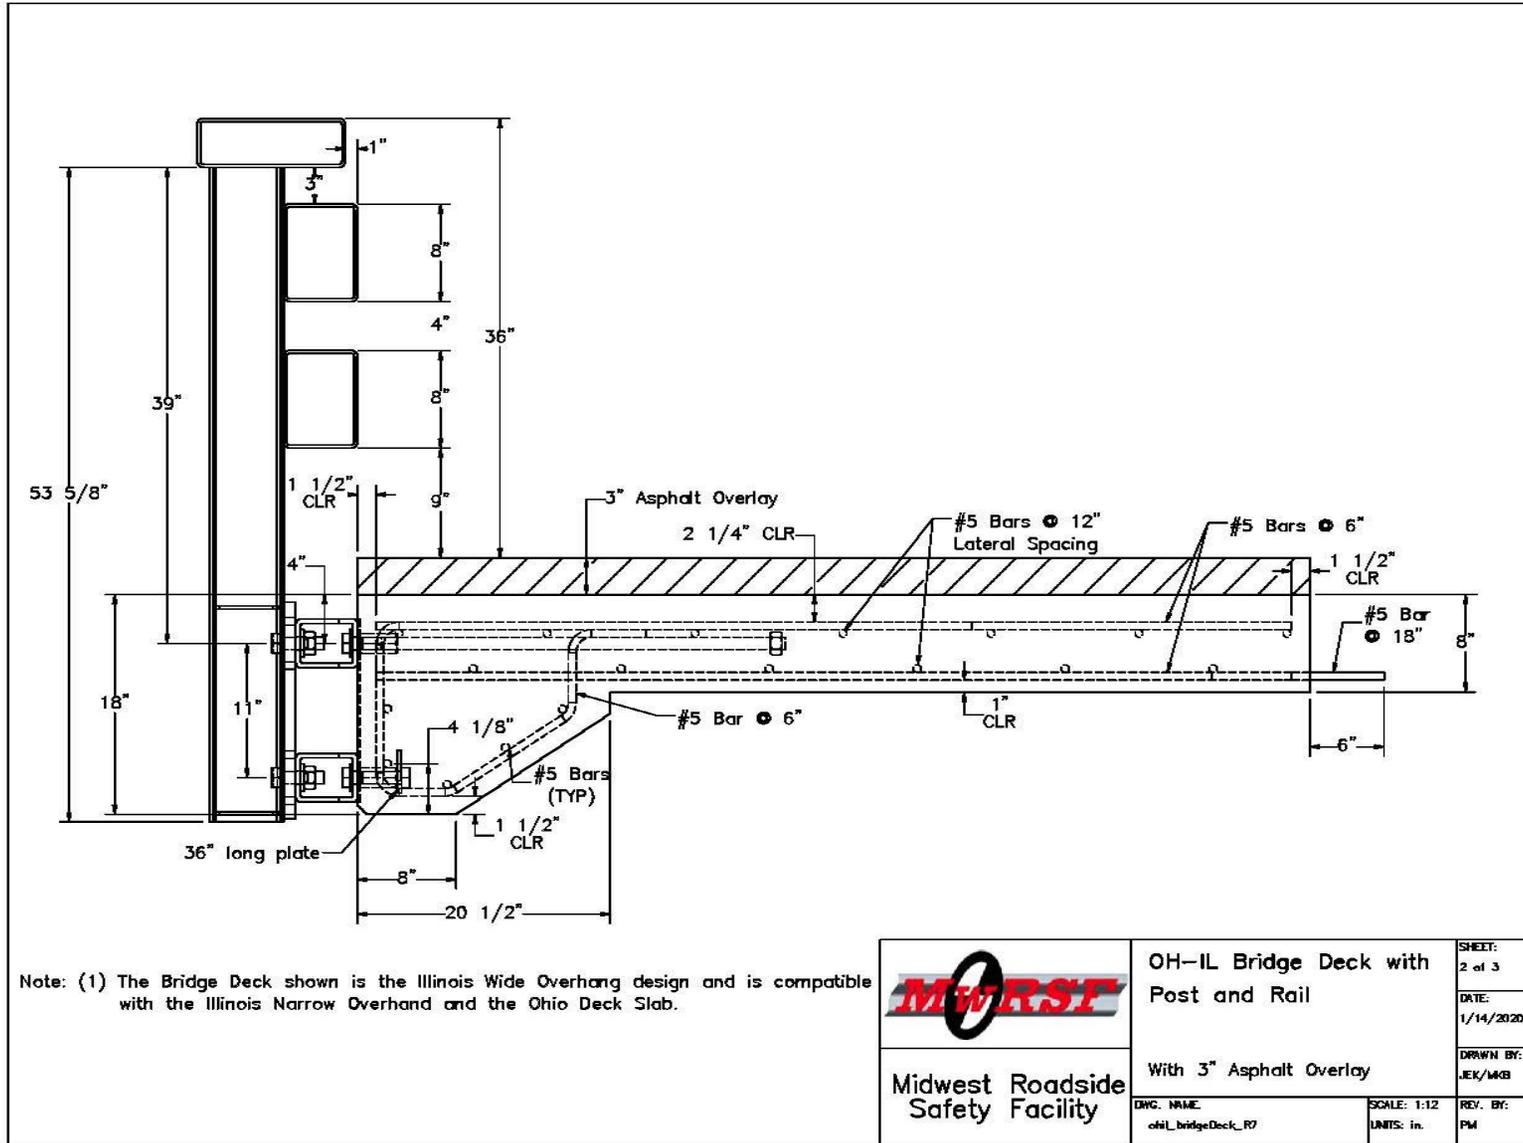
Typical Slab Deck Reinforcement Configuration with Future Overlay
